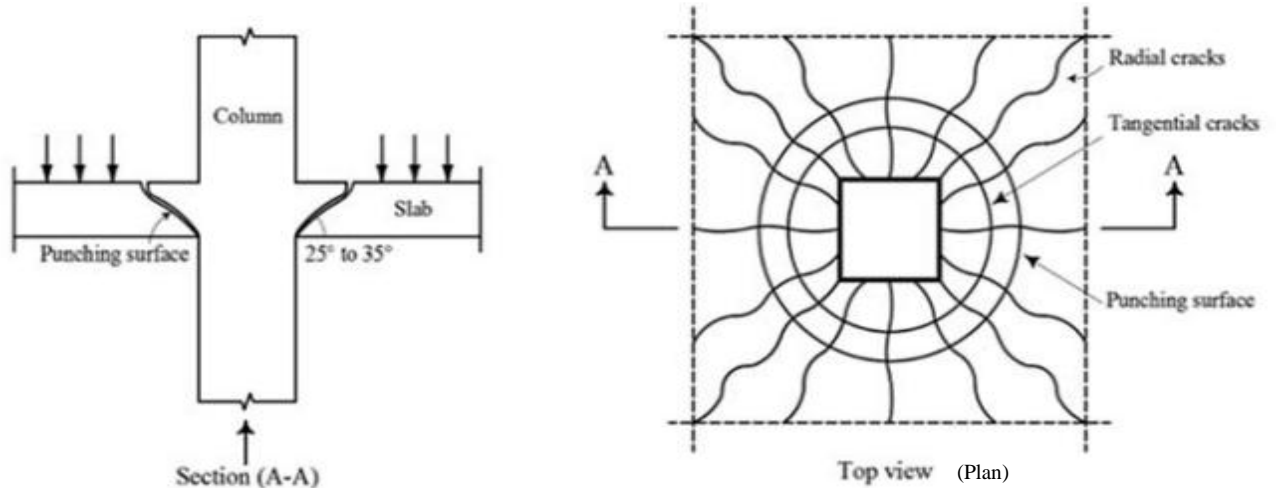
Crack Pattern in Punching Shear Failure (Osama et al., 2017)
